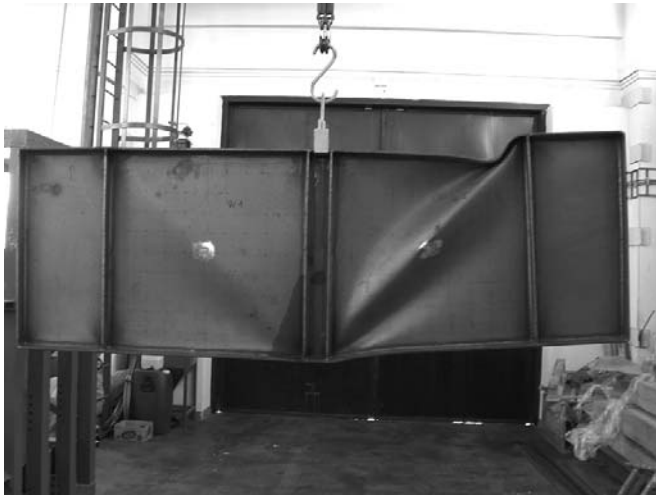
The failure mechanism of one of the test girders subjected to constant loading
